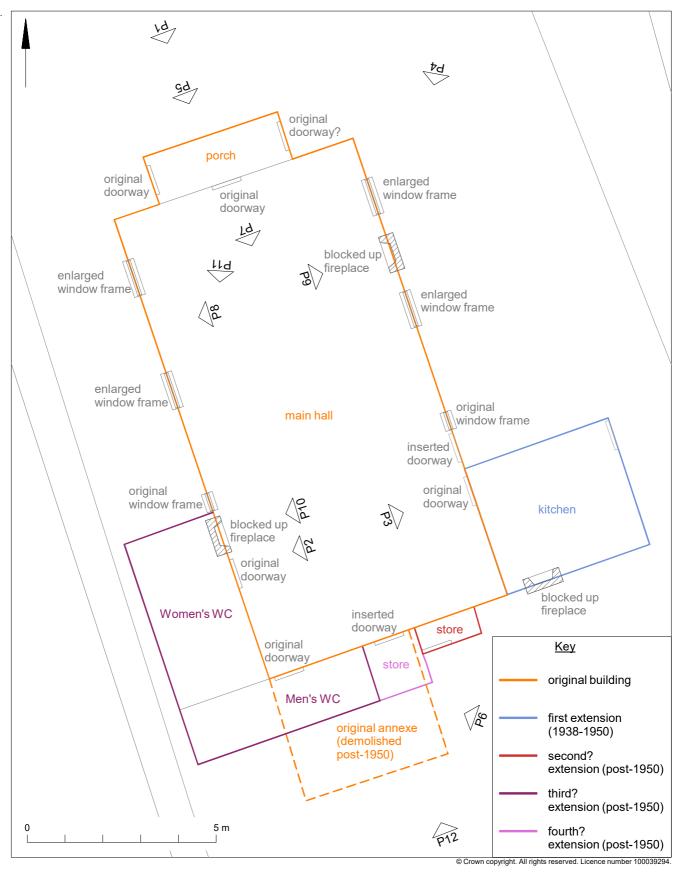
Detailed plan of building, showing current room uses, internal walls, features and different phases of construction. Arrows indicate the location and direction of photos in the main text.
